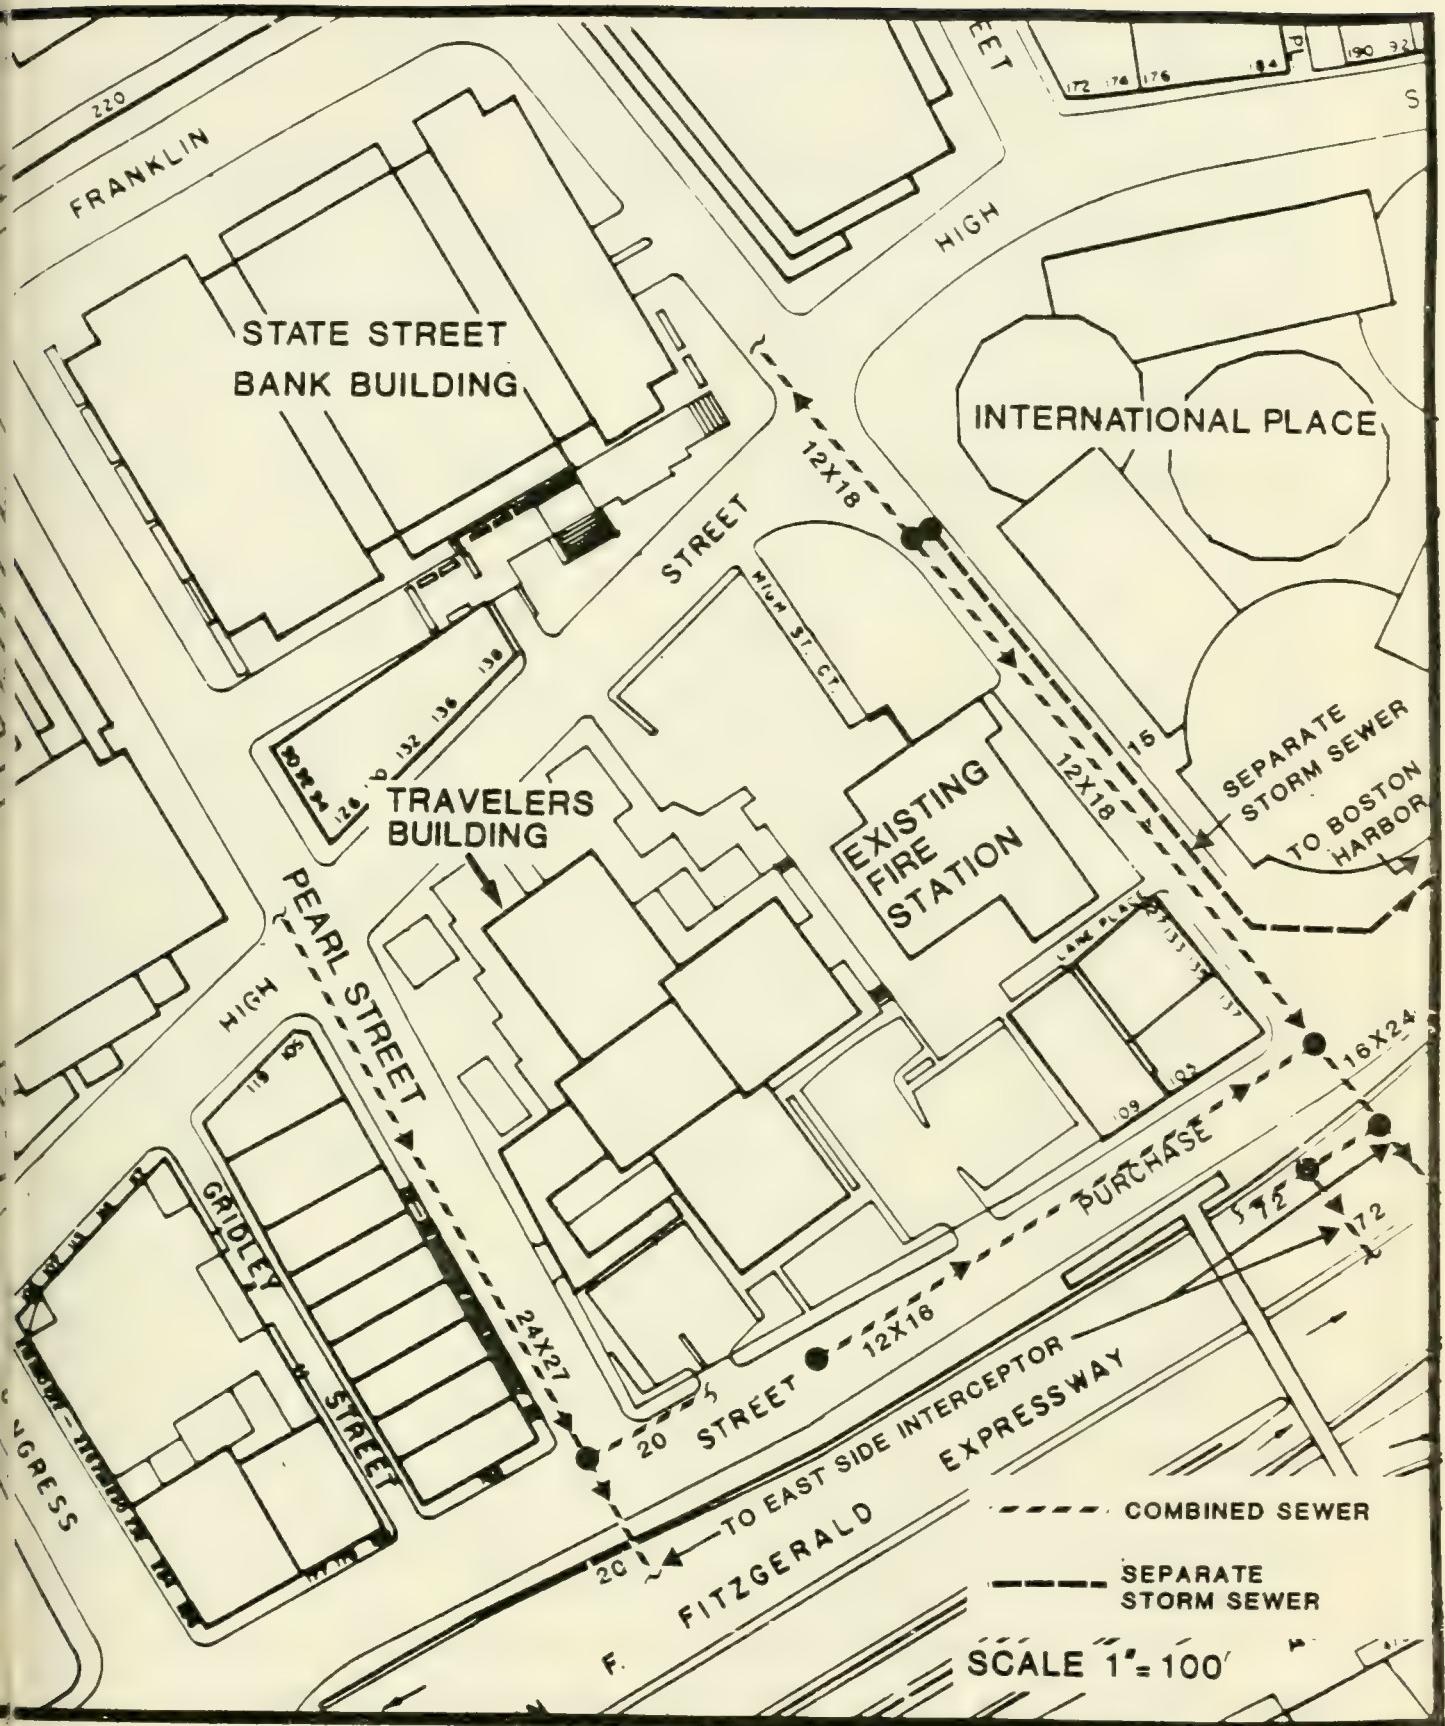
SITE AREA - EXISTING SEWERS
